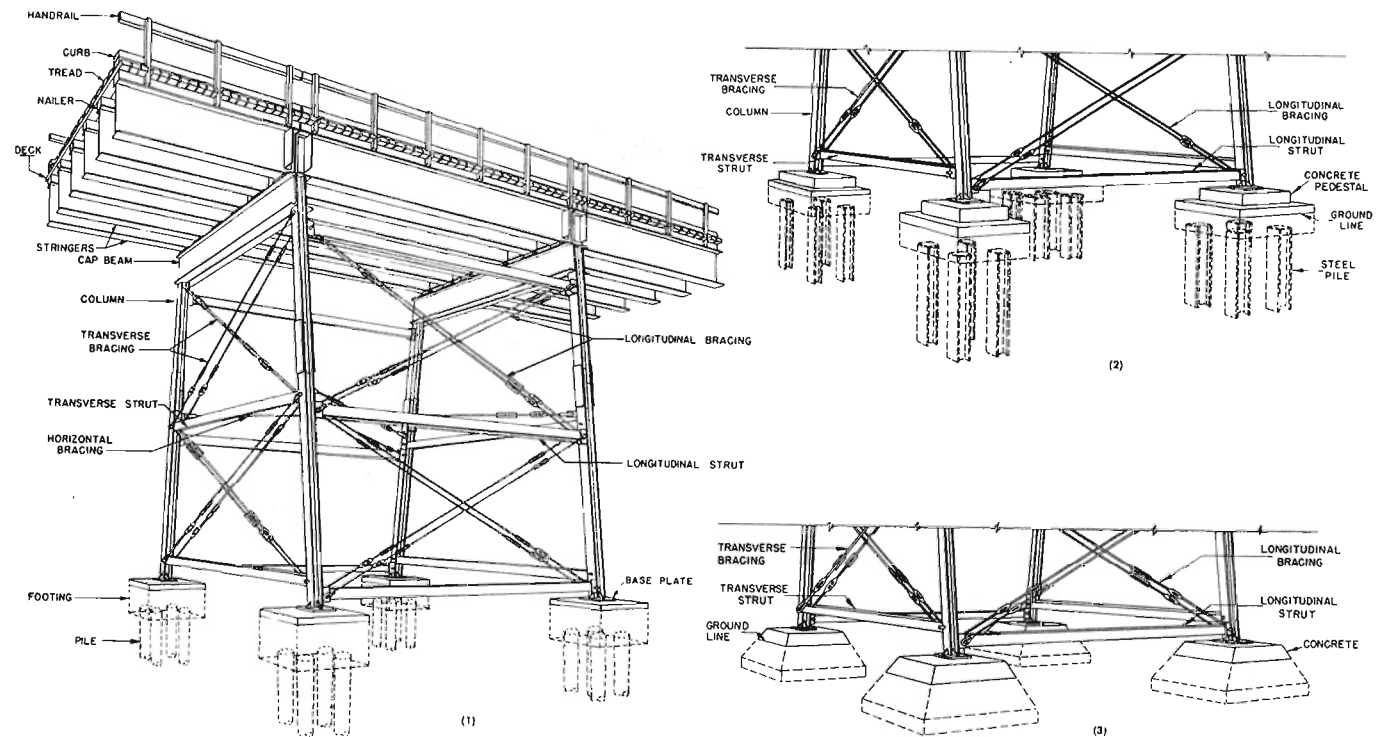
Highway bridge, class 25 or class 50, double-lane, steel stringer spans, steel tower:
